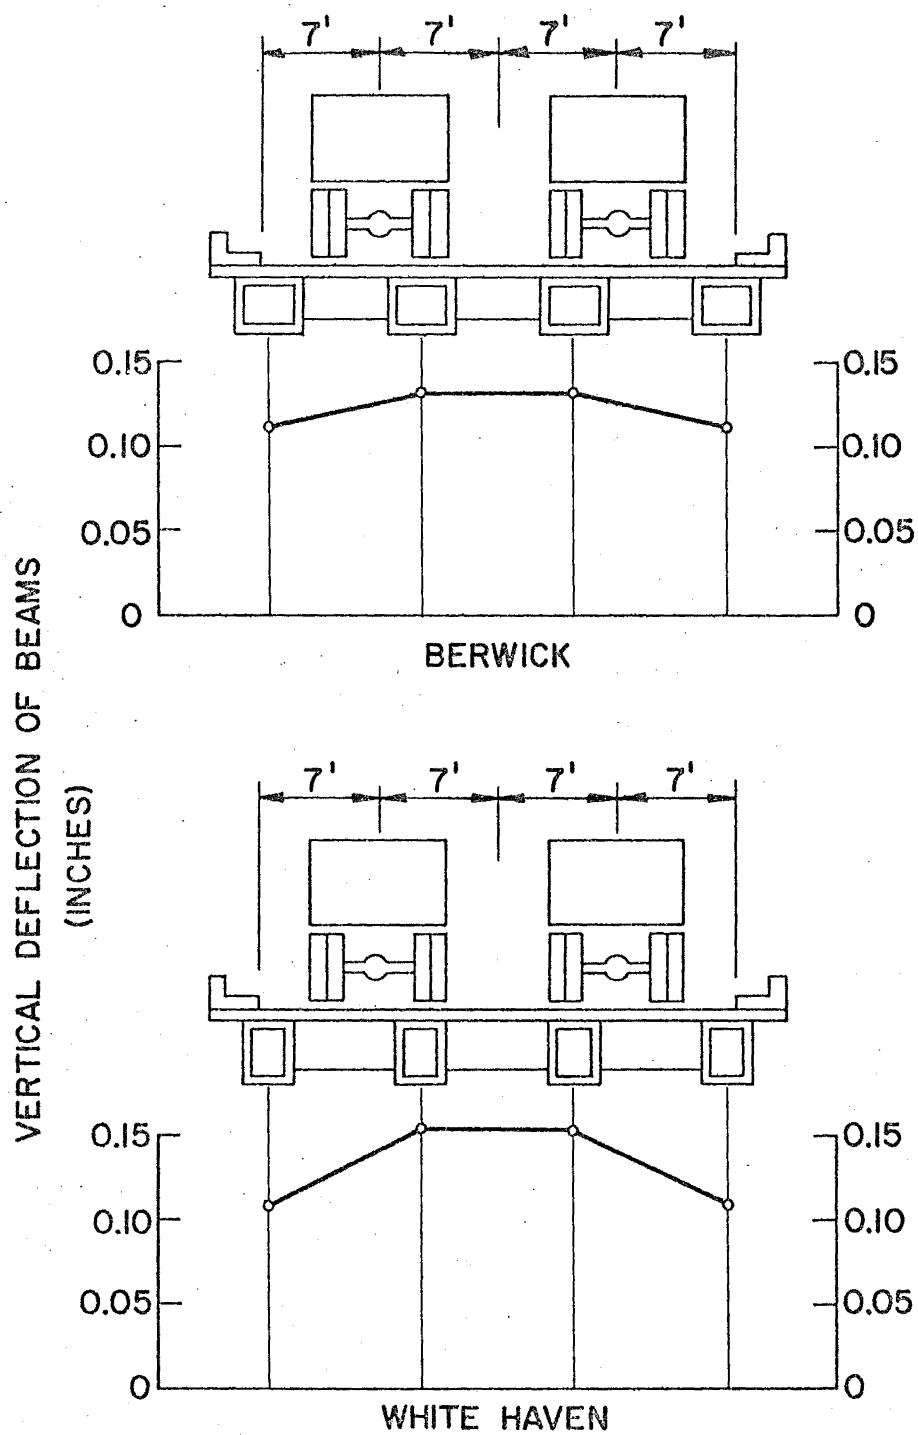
Beam Deflection Profiles (All lanes loaded)
